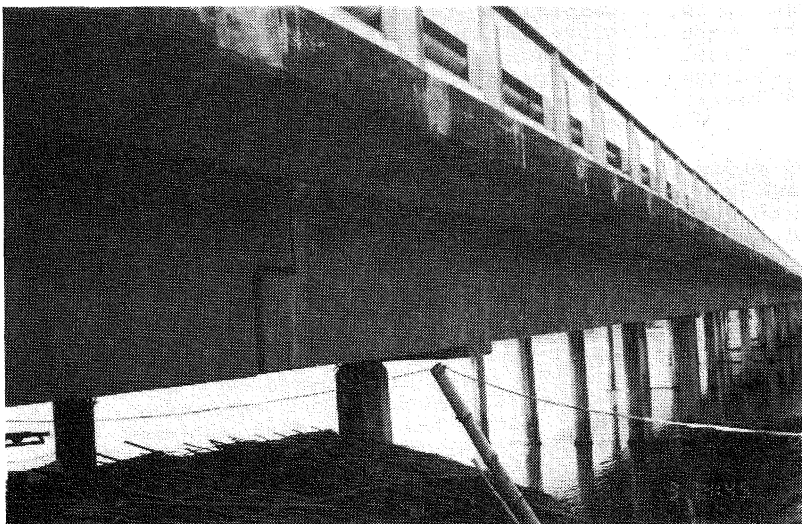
Reinforced concrete bridge supported on concrete piers and transverse diaphragms
